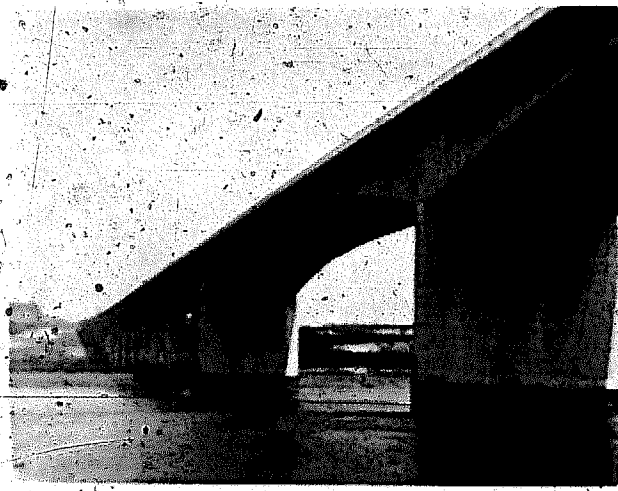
Medway bridge, a double cantilever beam bridge opened in May 1963
